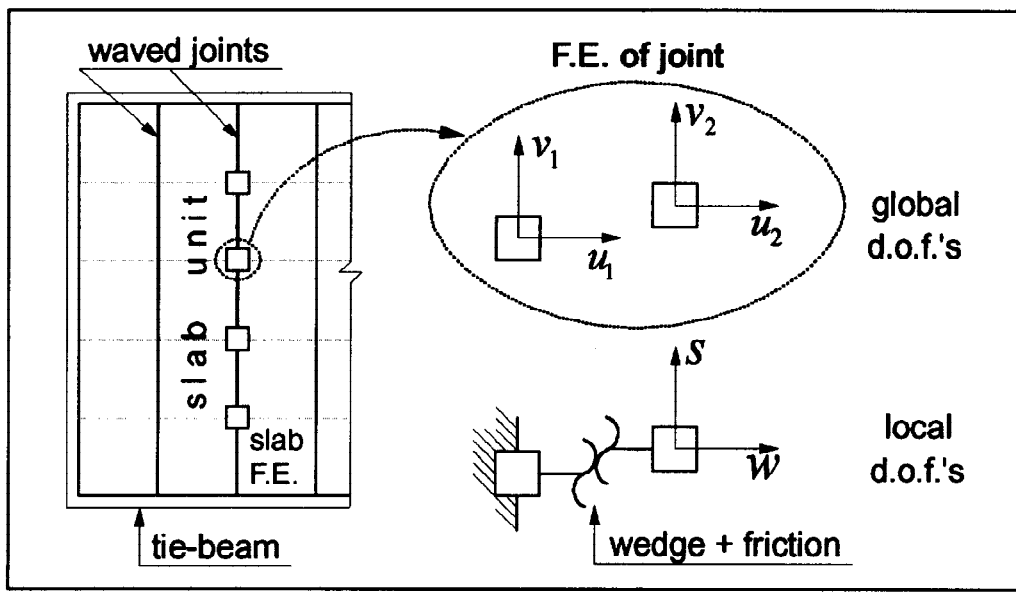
Finite element of longitudinal joint between adjacent precast slab units.
